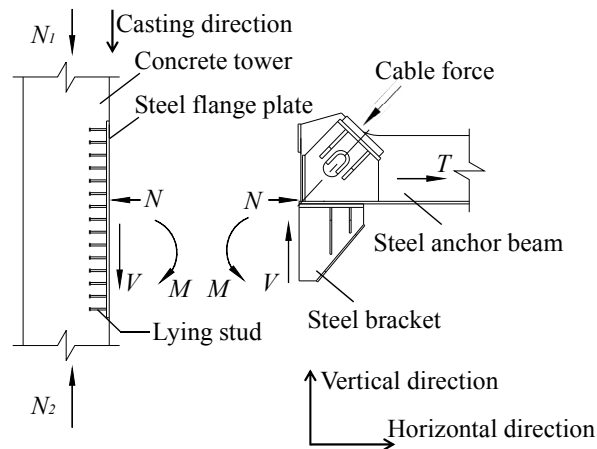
Mechanical model of lying studs in the cable-tower anchorage area
